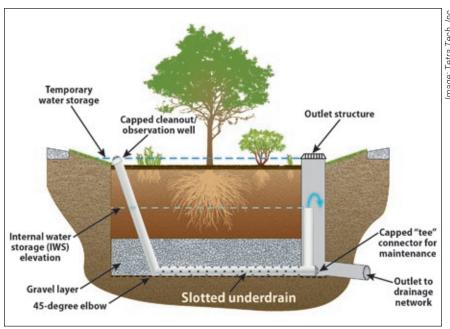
In this underdrain design cross-section image, an upturned pipe connected to a slotted underdrain ensures that a permanent internal water storage layer is maintained within the practice before the excess infiltrated water spills into a secondary drainage network. In this design, a surface overflow drain is included to provide added protection against high volume flows.
